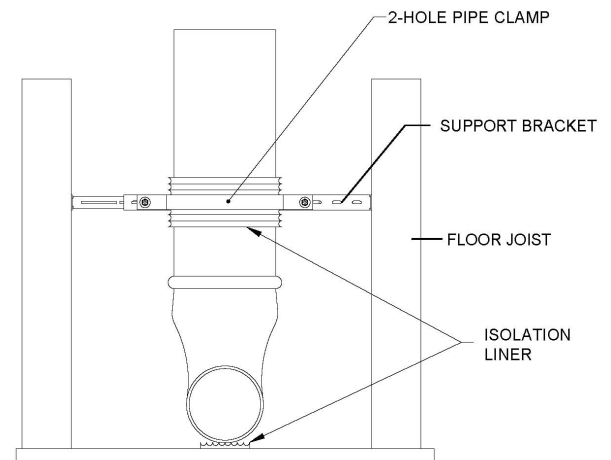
Isolation Through Wall Stud or Other Wood Framing Member
